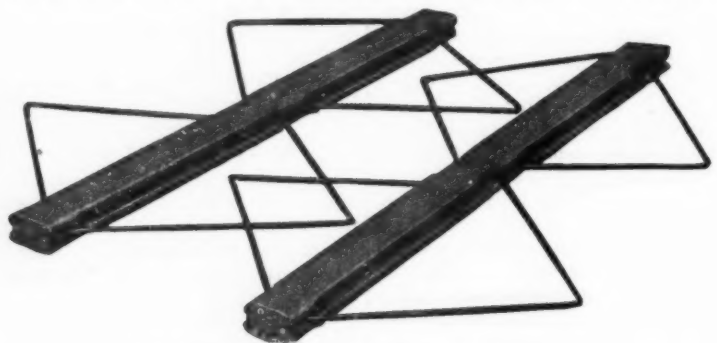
NEW REINFORCEMENT FOR CONCRETE.
